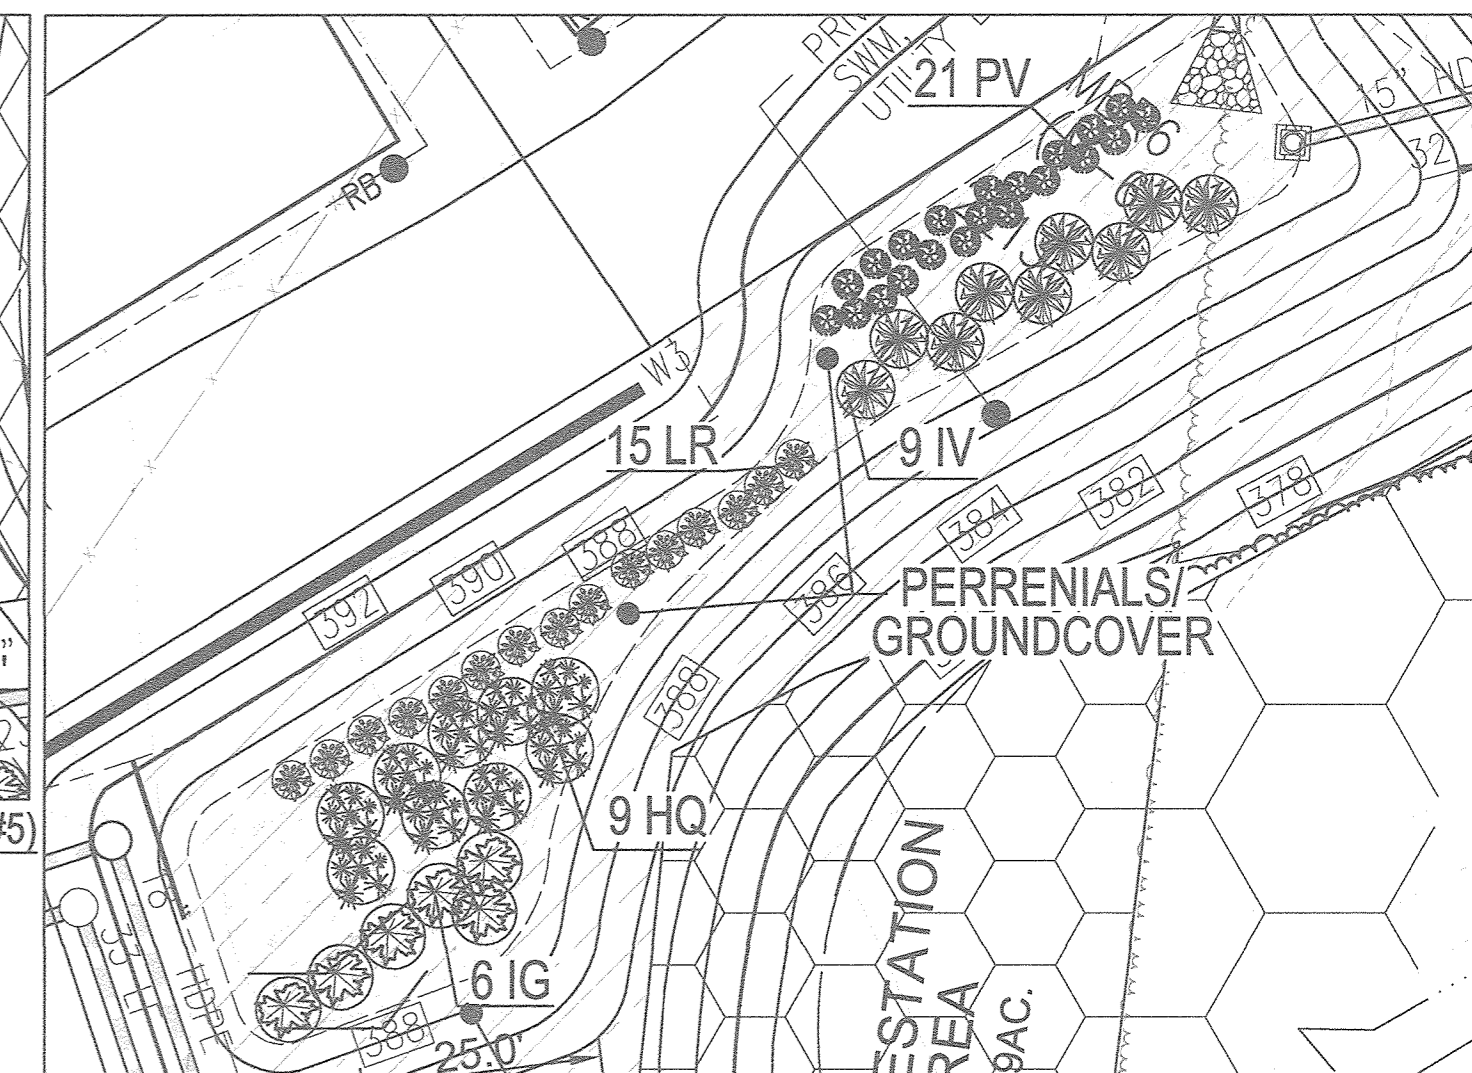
DETAILED BIO AND PLANTING PLAN (SWM #3)
